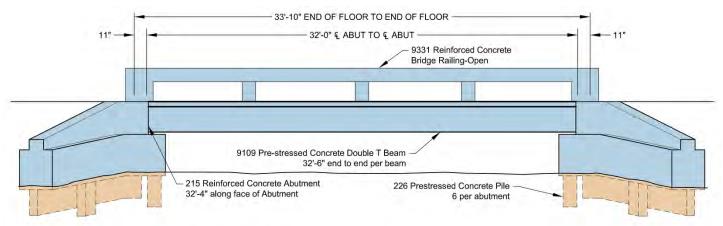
EI.24.6- 1: Elevation view of prestressed concrete double T Beam bridge
